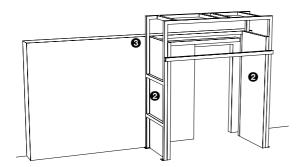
Example of a corridor, built around the frame and the cold store door
